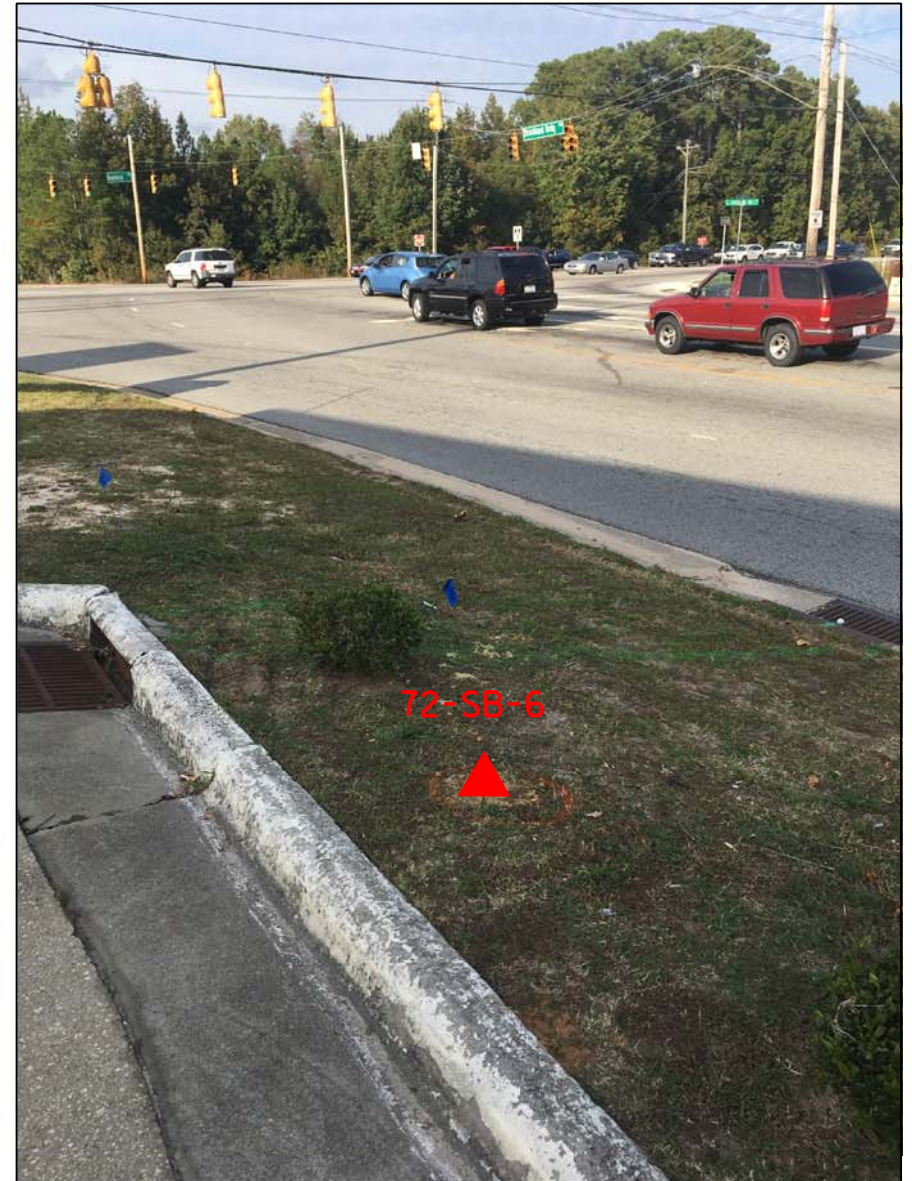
VIEW OF SOIL BORING LOOKING NORTH
